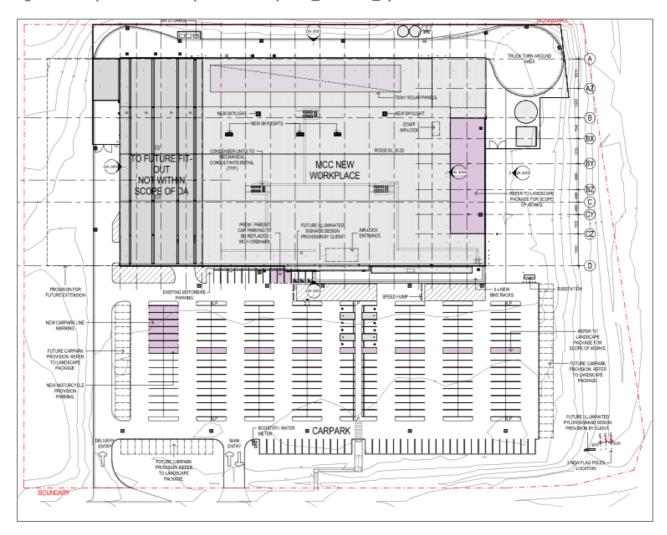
Proposed Site Plan (Source: Group GSA\_DA-1103\_F)
